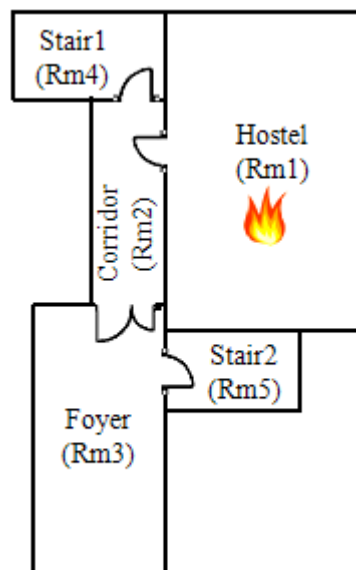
Geometry showing the rooms as modeled in BRANZFIRE – Hostel fire on Floor 3
